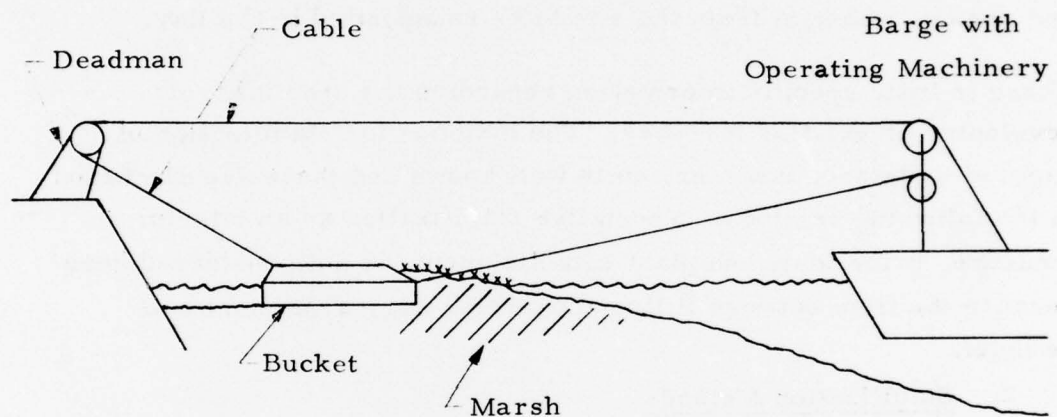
Possible Method for Excavating In Inaccessible Areas
